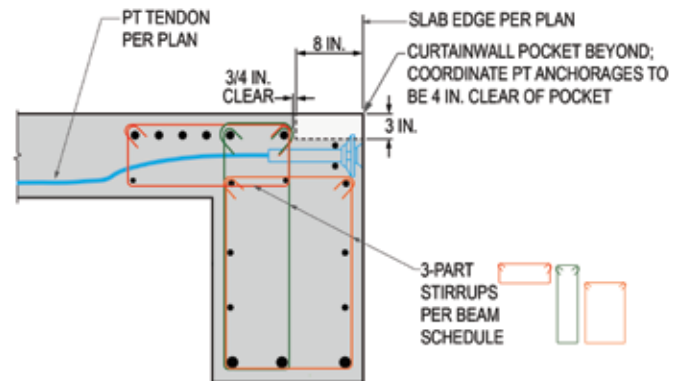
The spandrel beam reinforcing was coordinated with curtain wall anchor pockets and PT tendon anchorages (Note: 1 in. = 25.4 mm)
